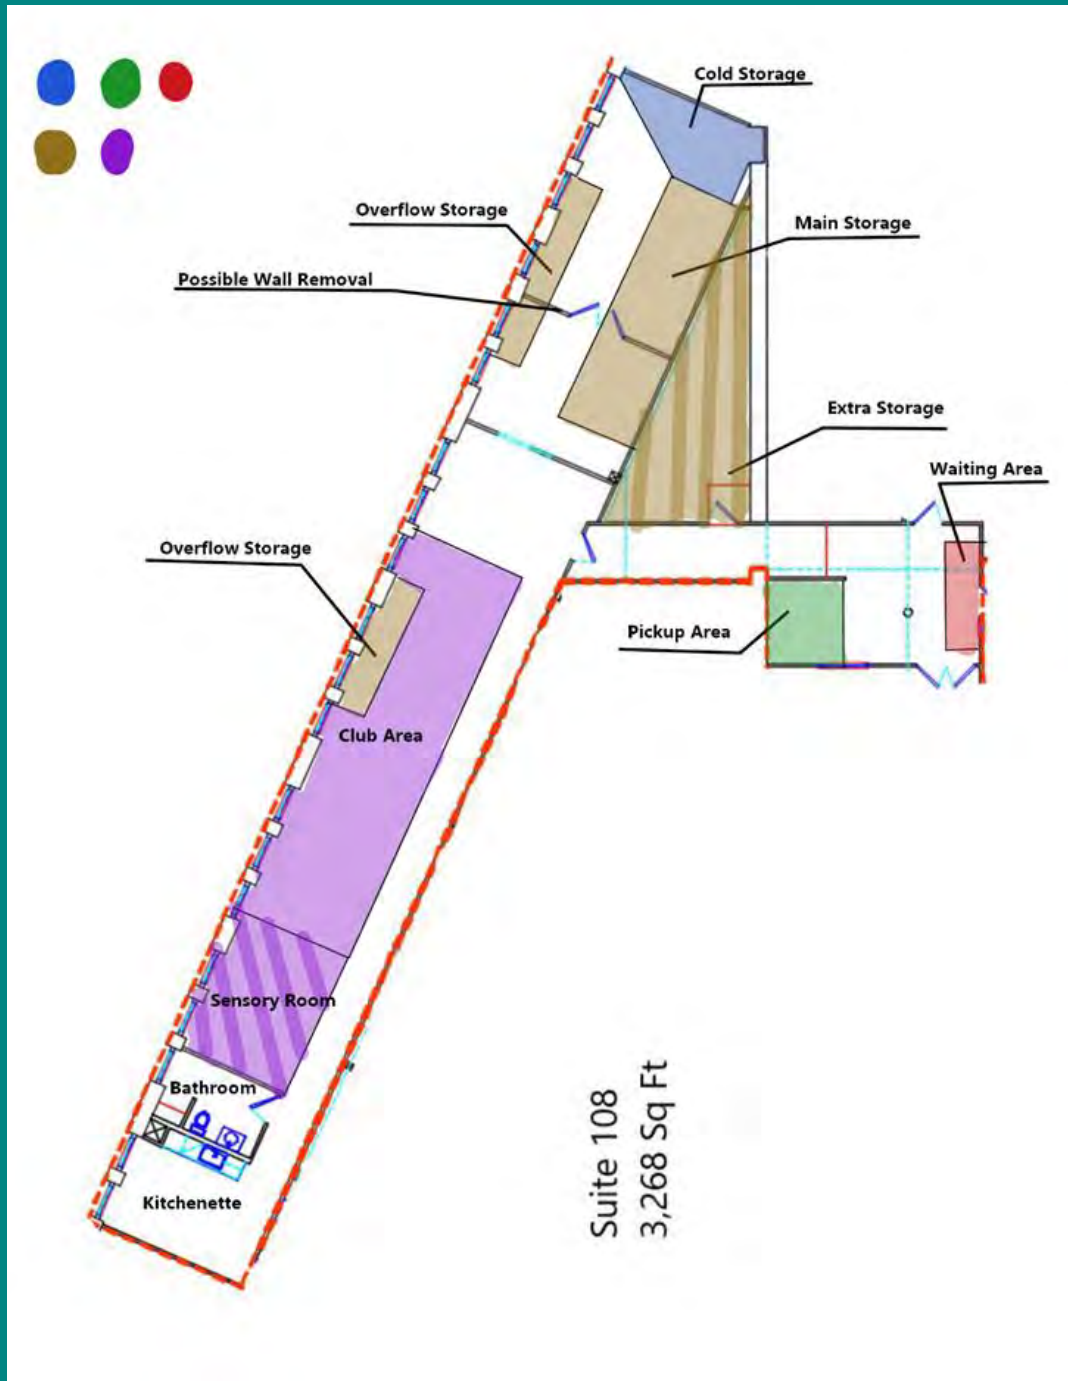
Site Layout for the Food Pantry, Club Area, and Sensory Room.
